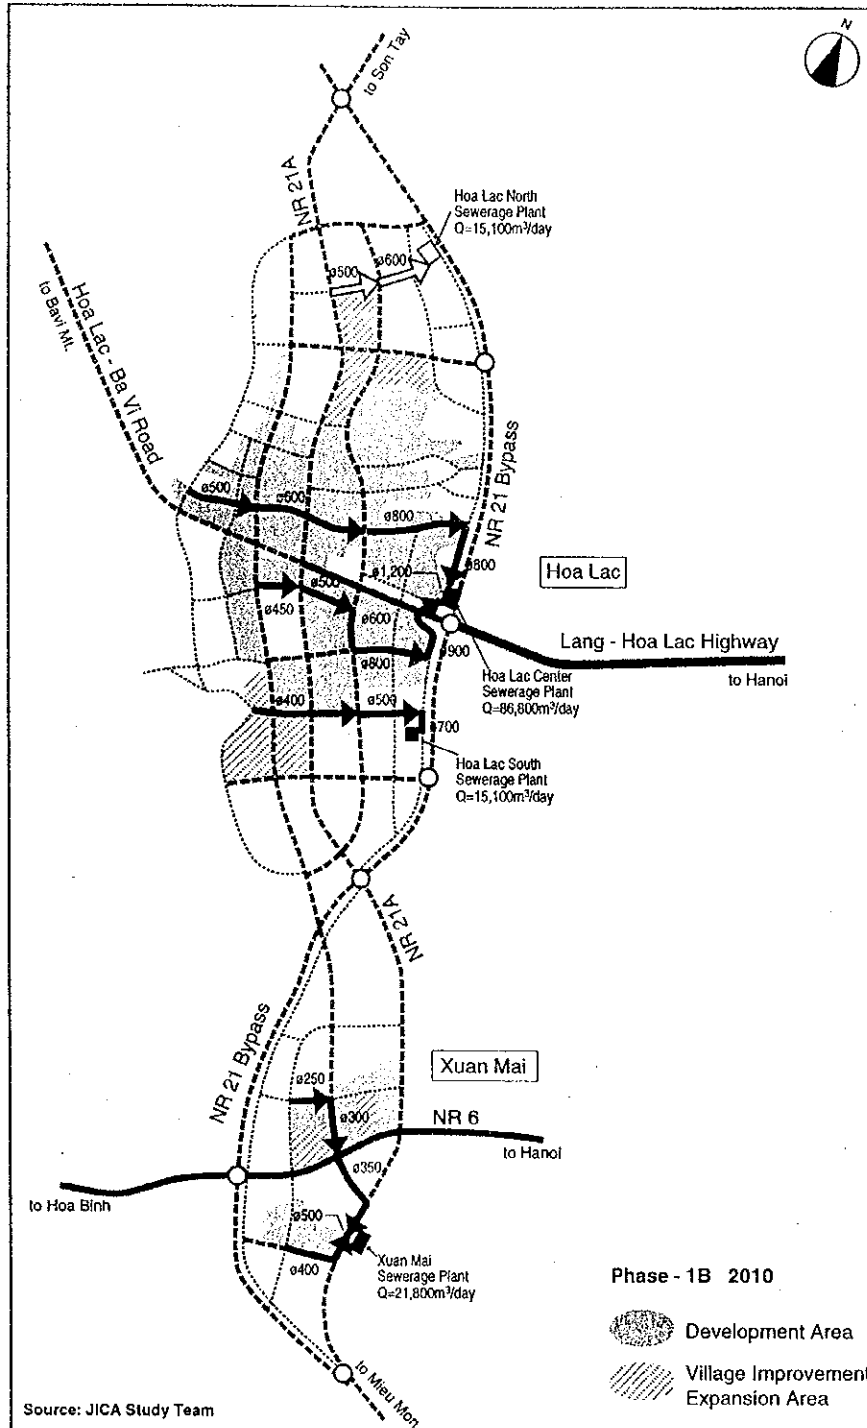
Sewerage Disposal Plan: Phase-1B
